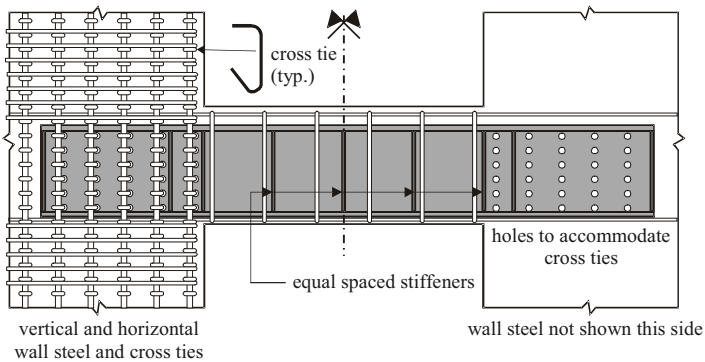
Example of typical detail of coupling beam embedded in RC wall (adapted from Lehmkuhl 2002). See footnote 1 on page 11 for additional information.
